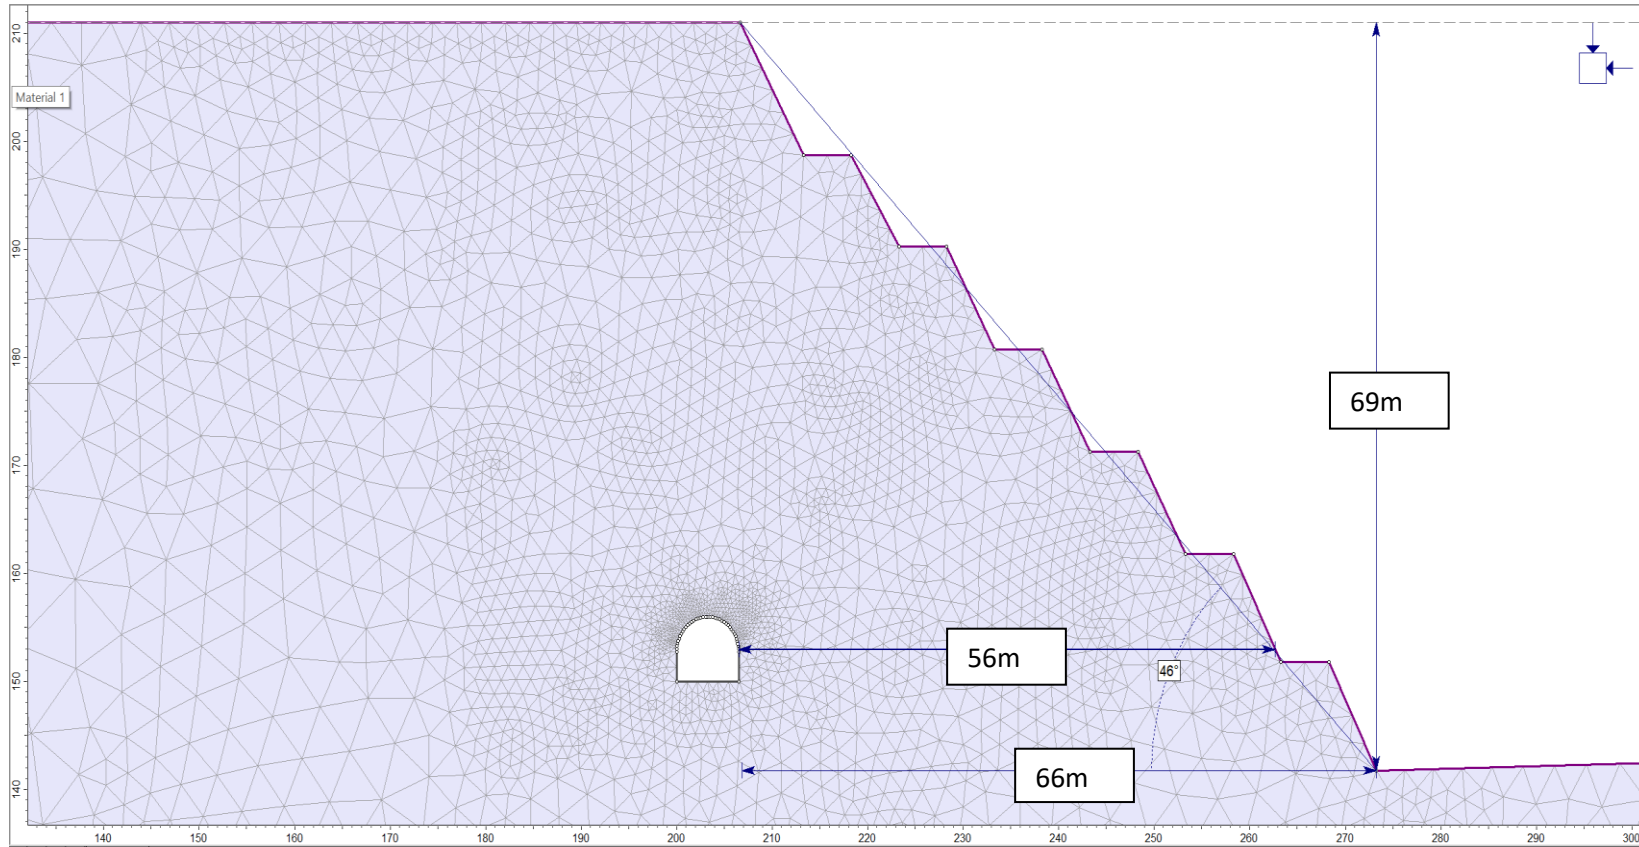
Slope dimensions and finite element model of the planned slope profile, section A-A', Km 26+640
